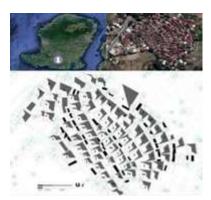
Sade Traditional House Siteplan (Source: Susilo et al., 2019)
